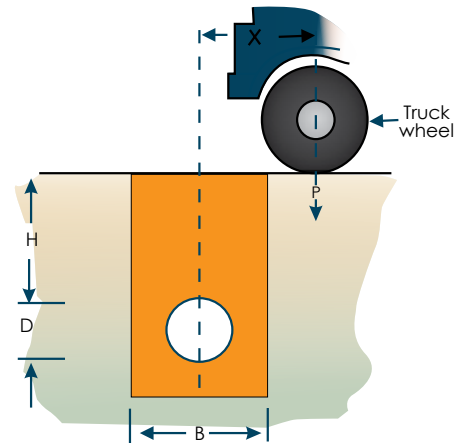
WHEEL LOAD ON BURIED CONDUIT
